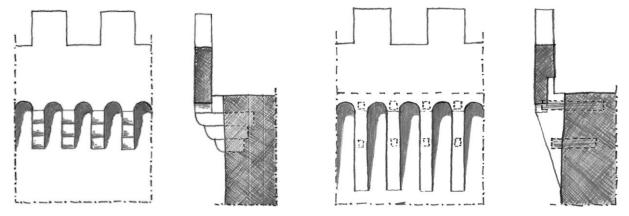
Overhanging battlement with corbels made of stone cantilevers (on the left) or of brick or stone masonry reinforced with timber cantilevers (on the right) (drawings by E. Zamperini).
